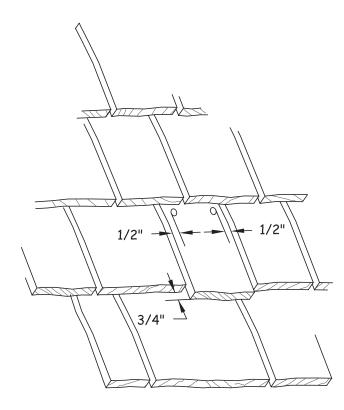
This drawing shows how to space the nails when you install a replacement wood shingle.
